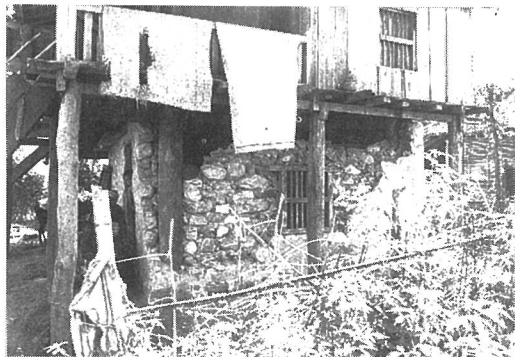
A damaged mud-stone farm house, Gaighat, Nepal
